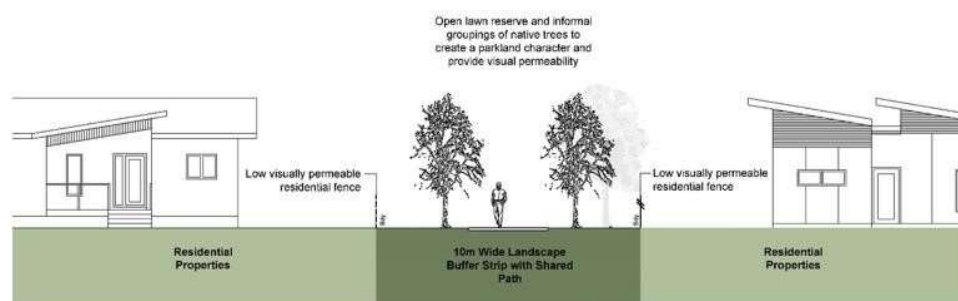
D: Cross section illustrating the 10m wide Landscape Buffer Strip with Shared Path
